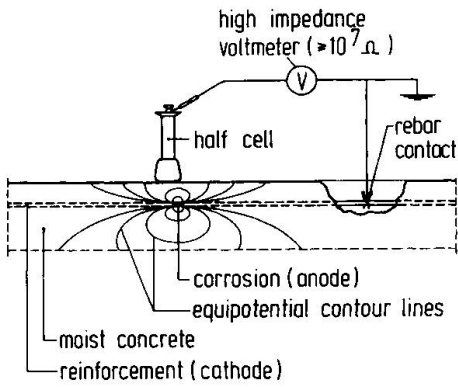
Scheme for potential measurements with a half cell on the surface of a reinforced concrete member
